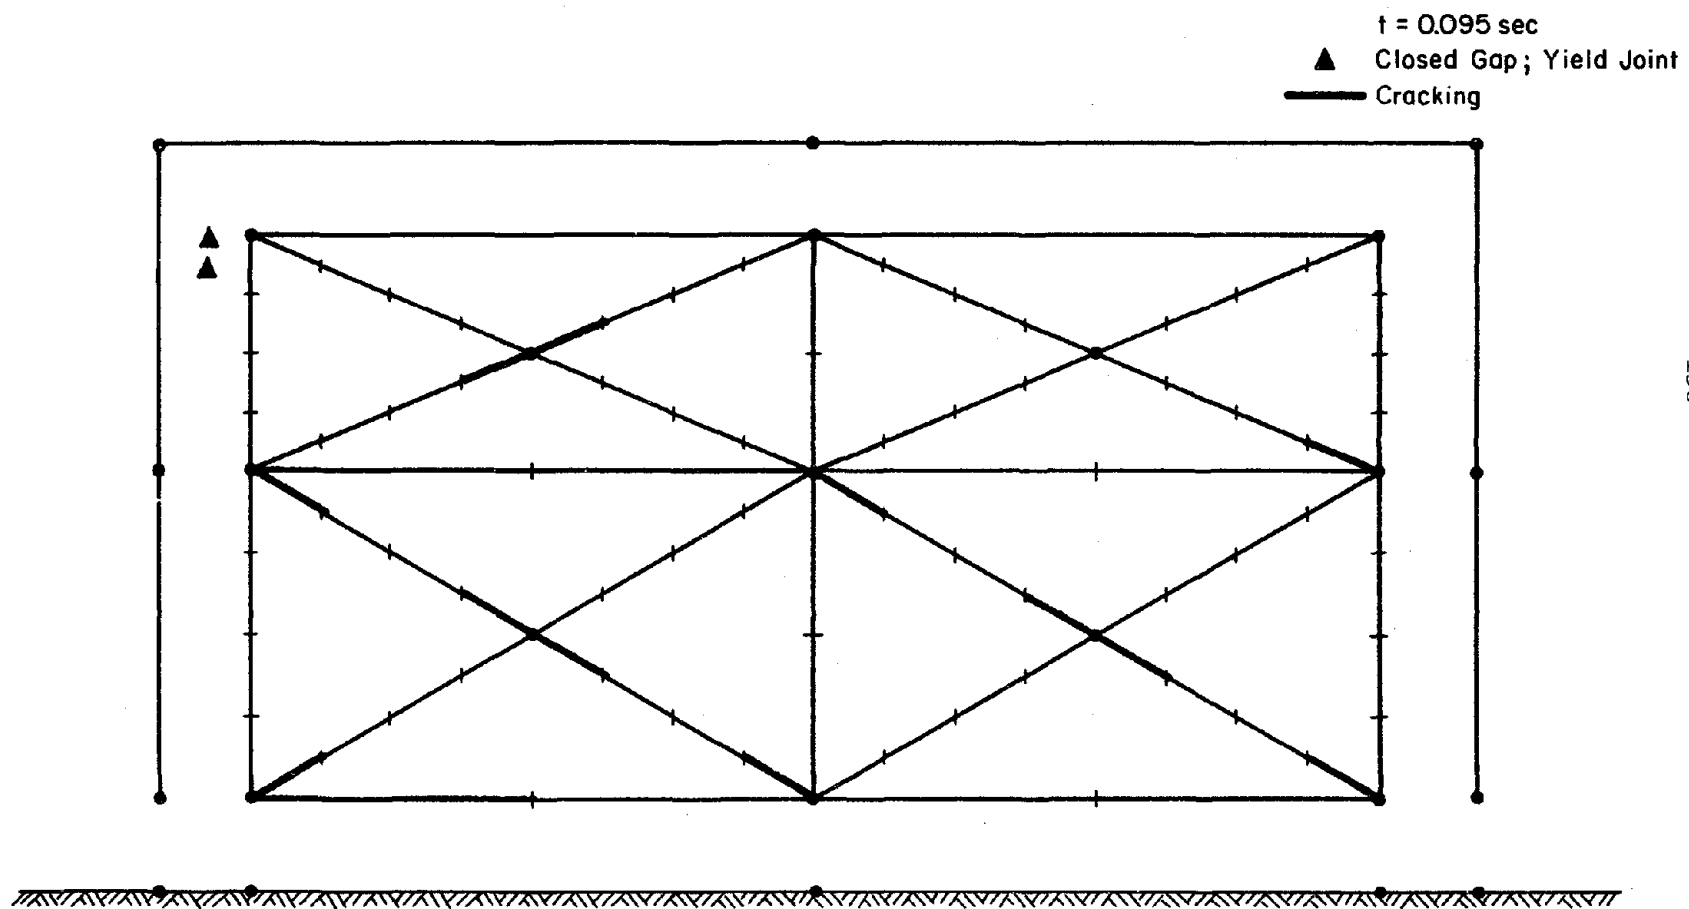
Crack Pattern: Frame Wall-Gaps(II) at $t=0.095 \text{ sec}$
